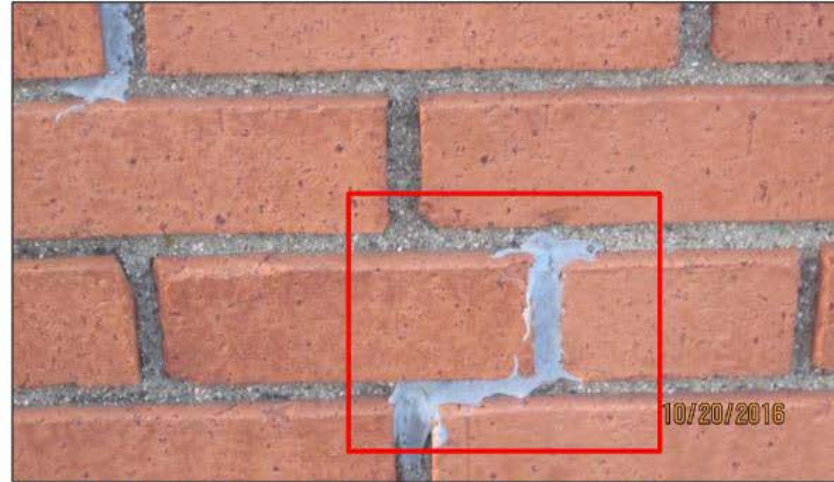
Same elevation as Figure 20, additional image of added sealant to a mortar joint.
